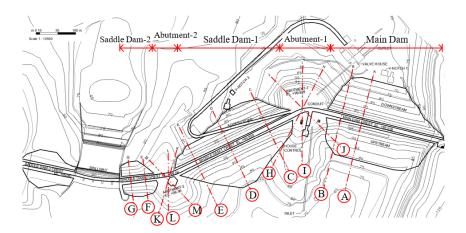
Location of the cross-sections on the dam plane for slope stability Source: Halim (2023).
